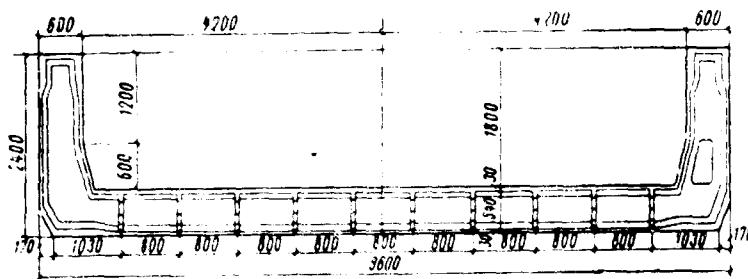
Design Midship Frame of a Barge Made of Reinforced Concrete.
